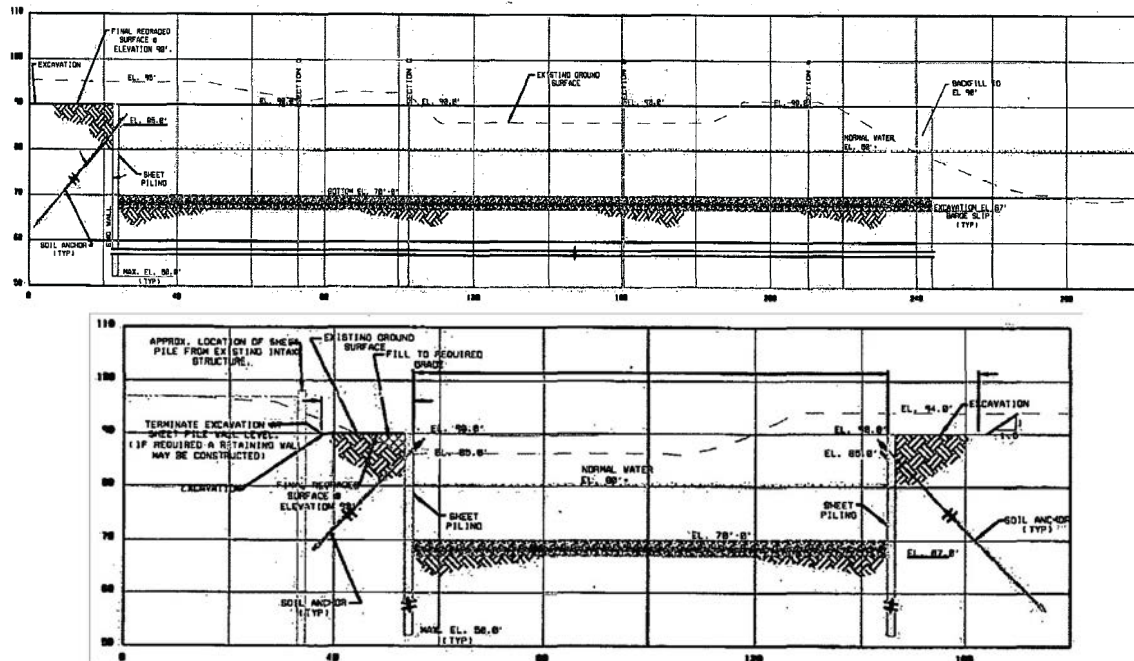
Section View of Proposed Barge Slip (Southern 2007c)
